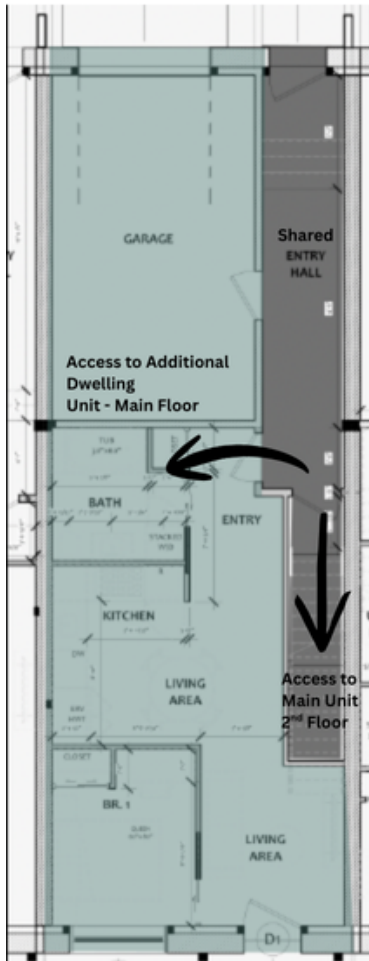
Sample Floor Plan with shared entry, ADU on main floor and primary unit on second floor
